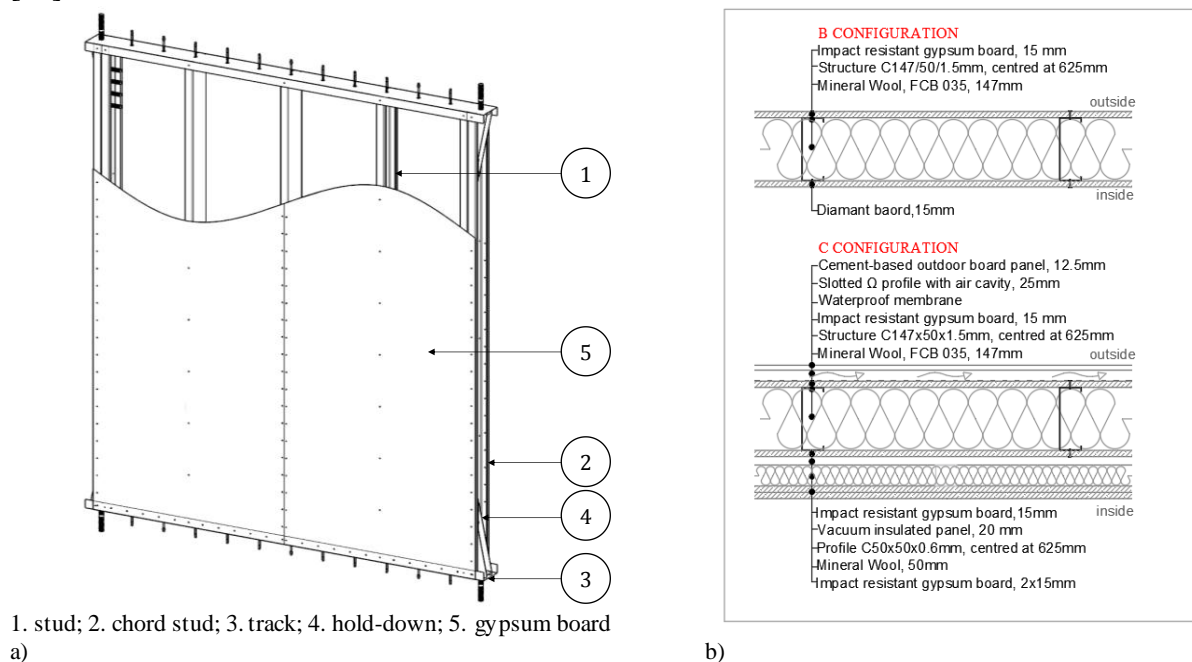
a) View side of the B wall Configuration, b) Sections of B and C wall Configurations
